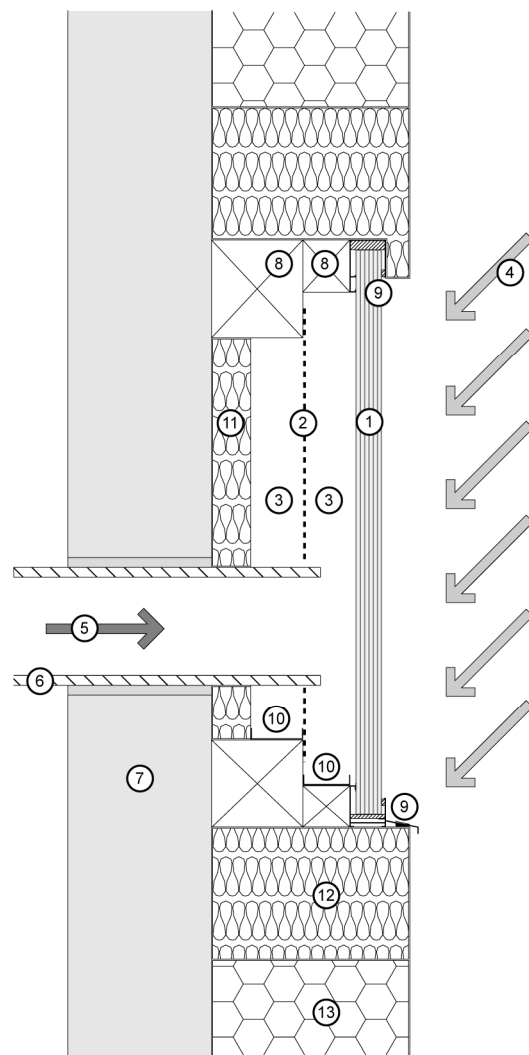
contains a section through the inlet of the aerogel solar collector. The prototype consists of a 6 x 0.9 metre timber frame, painted black, at high level, retrofitted to the outside of the dwelling's existing south facing concrete façade. Fixed to the timber is an aluminium frame to support the cover system. Two 150mm diameter holes were diamond cut through the external wall, in the bottom left and top right corners of the collector to facilitate the inlet and outlet respectively. 50mm of mineral insulation was inserted in the back of the collector and around the perimeter of the timber frame to reduce back and edge heat losses. The absorber consists of three black powder coated perforated aluminium sheets fixed side-by-side spanning across the width of the collector. Each sheet is 1 mm thick and contains 4.7 mm diameter perforations at 8 mm pitches, creating a 40% open area. The sheet fitted on the inlet side of the collector has a pre-cut hole enabling the inlet ductwork to penetrate through so that incoming air passes over its surface. When fitted, there is an 80 mm cavity either side of the sheet.
